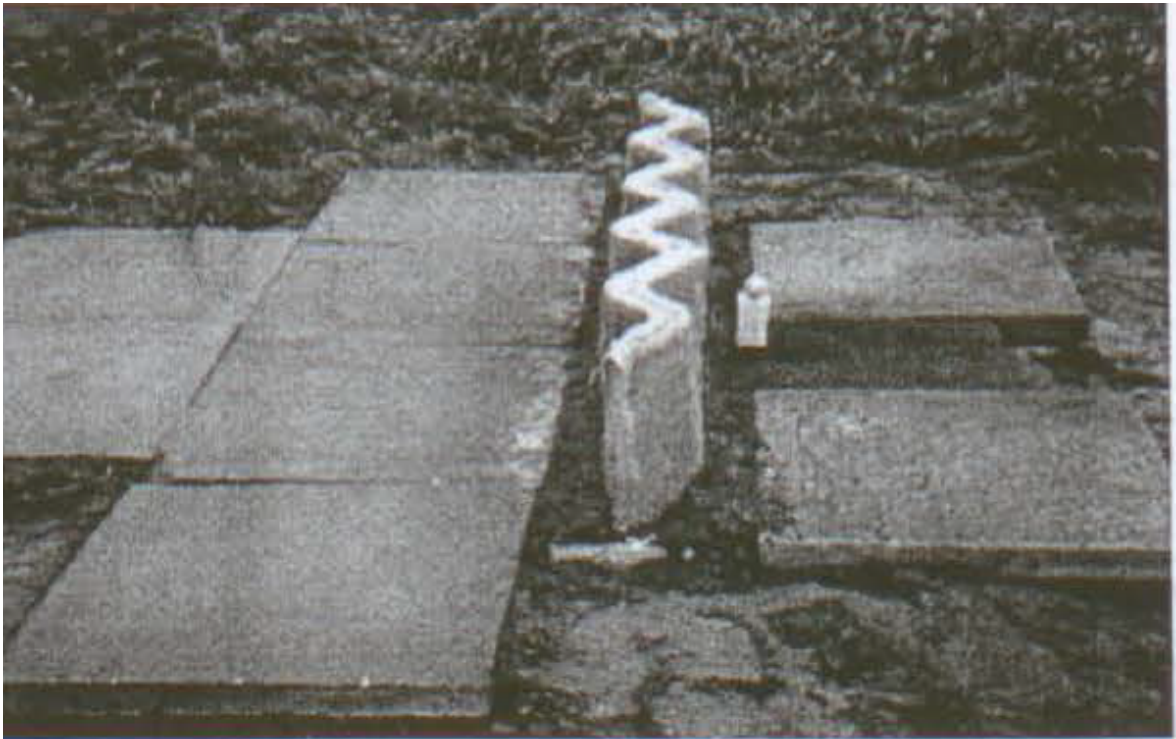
Zig-zagged wall used in the experiments of Rose *et al.* [5]
